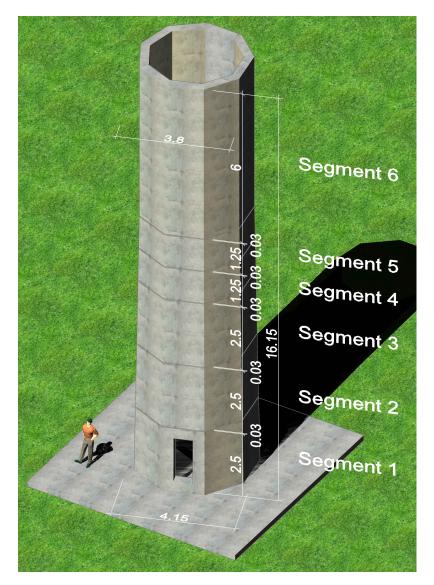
A rendering of the prototype tower section with it's main dimensions in [m]
